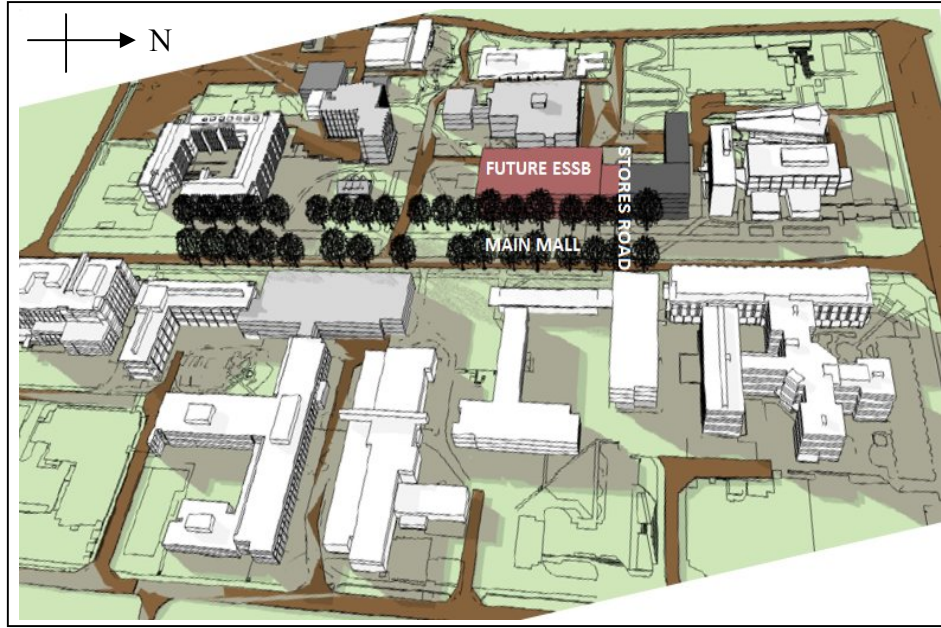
Preliminary structural model for the proposed Earth Systems Science Building (pink), to be located at the intersection of Main Mall and Stores Road. The dark grey attachment represents a future, connecting building site.
